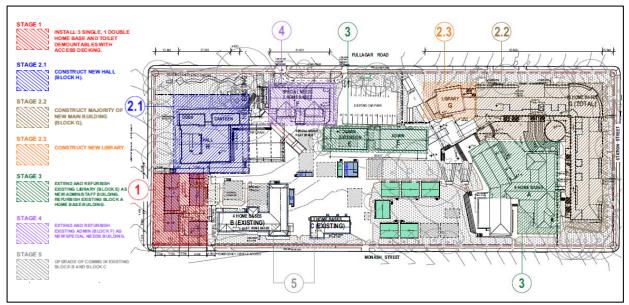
| Staging Plan (Source: Department's original assessment report 2019)
